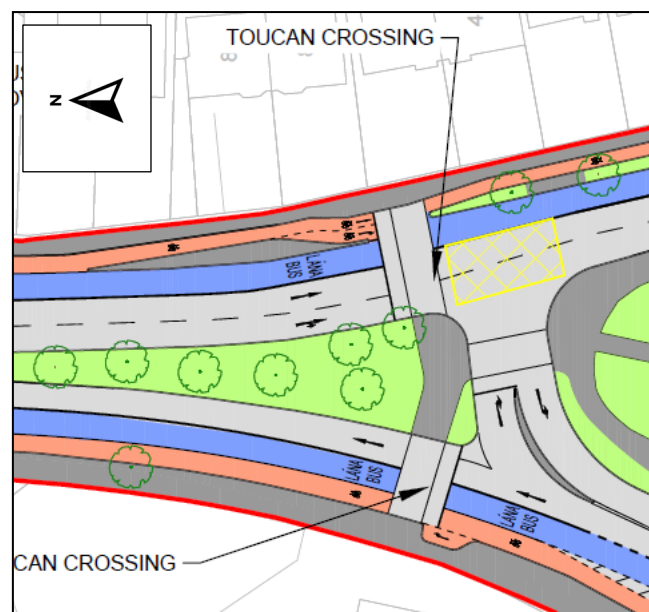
Extract from General Arrangement Drawing Sheet 8 at Junction of Ballymun Road and St. Mobhi Road
